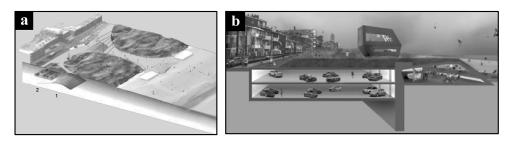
, a) the first plan including a co-located see dike (No. 1) and parking garage(No. 2) (adopted from Oerlemans and Baldwin (2013)) b) the second plan comprising of co-located parking garage, flood wall and restaurant (adopted from Van Alphen (2015))
